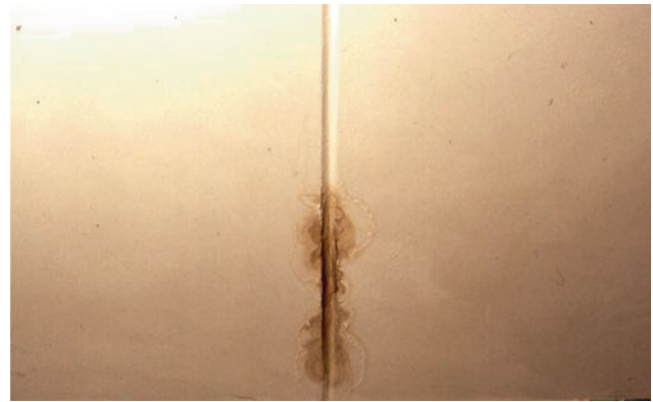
Low-sloped roof, improperly designed (inside to outside pre-fabricated concrete floor elements, glass fibre insulation, wet sloped screed, vapour tight membrane). Summer condensation of building moisture from the screed on the concrete floor elements causes moisture sweeping
